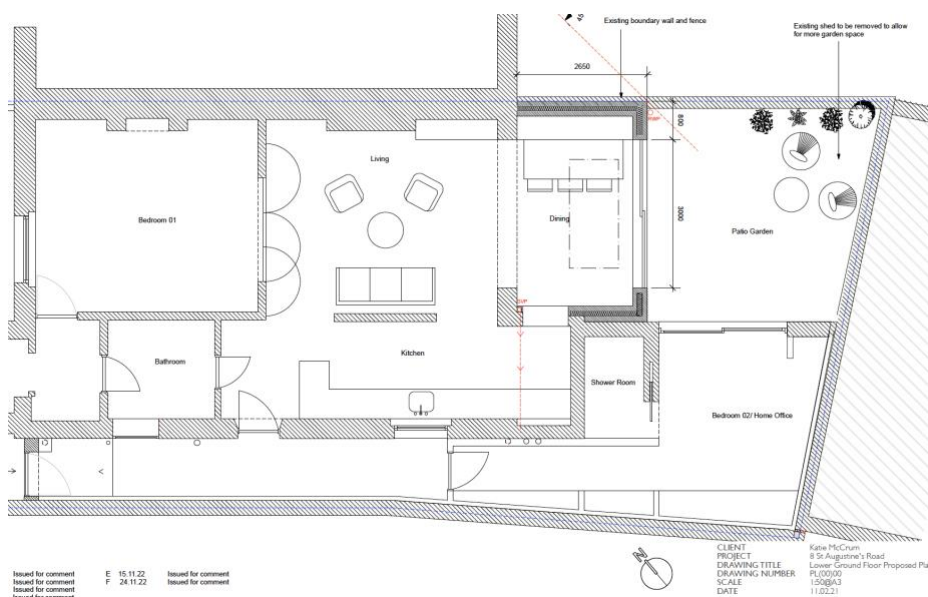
Approved 2023 Ground floor layout at Garden Flat at 6 St Augustine's Road
